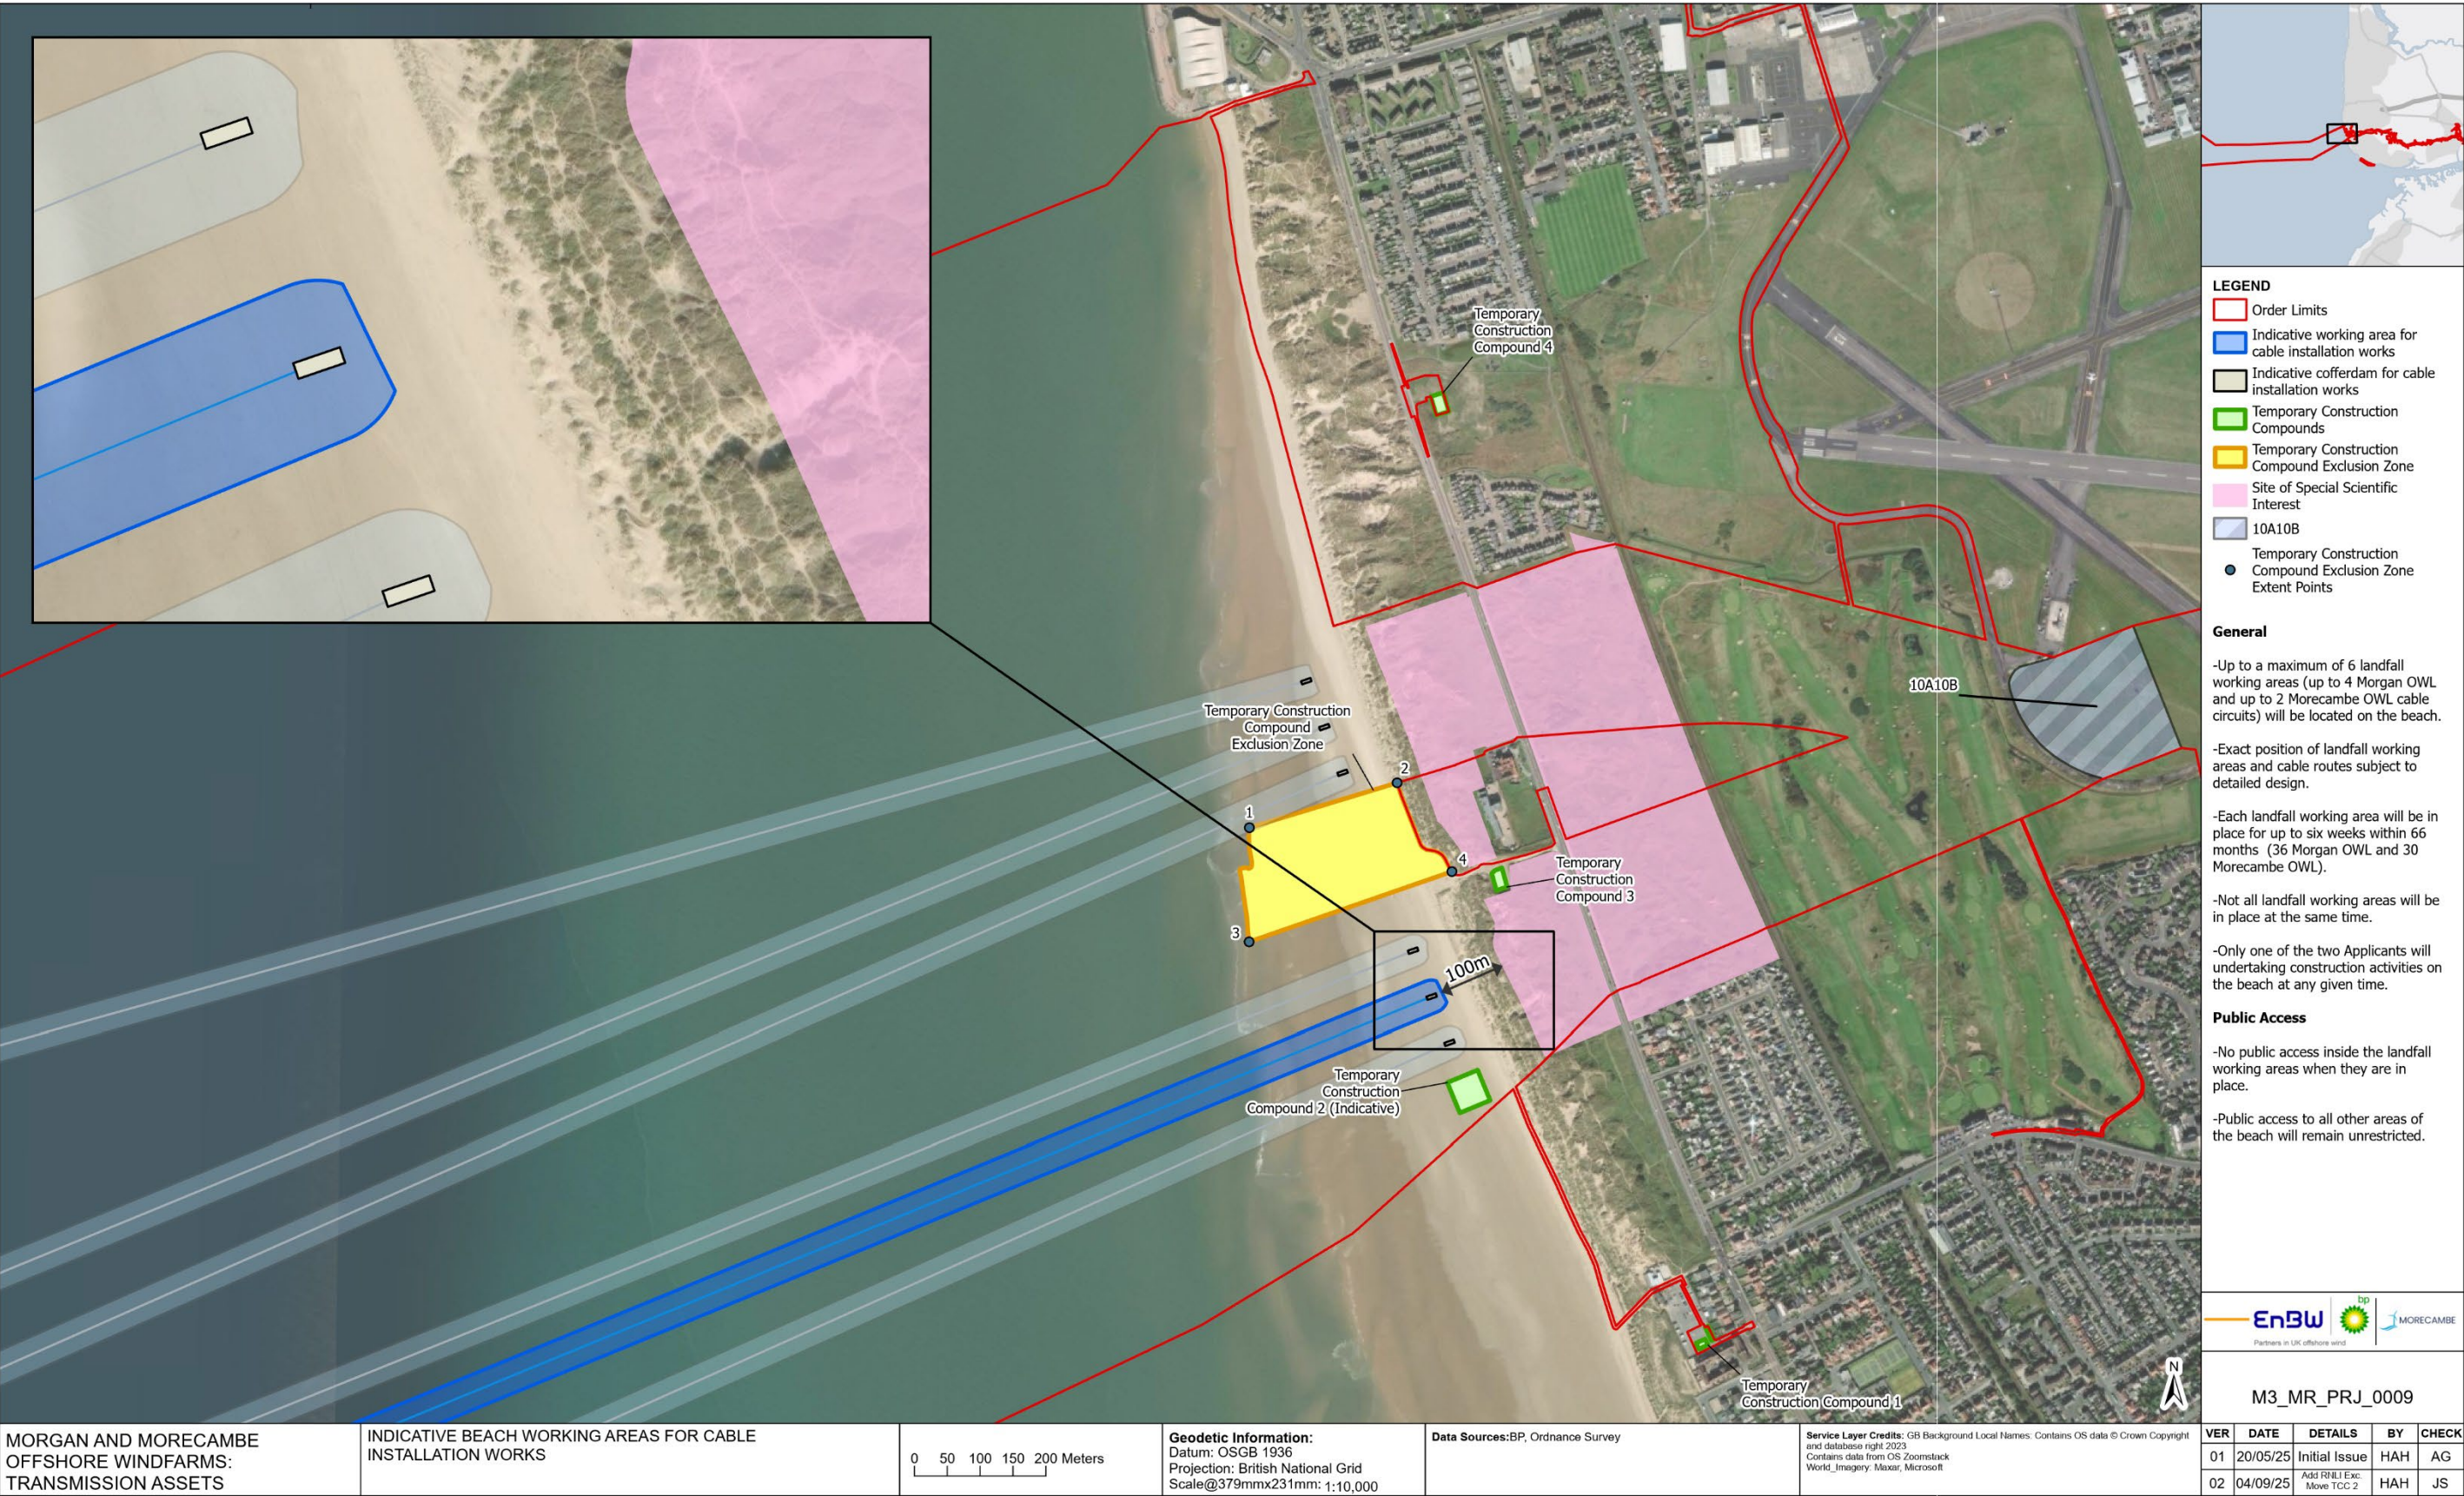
Indicative Beach Working Areas for Cable Installation Works
